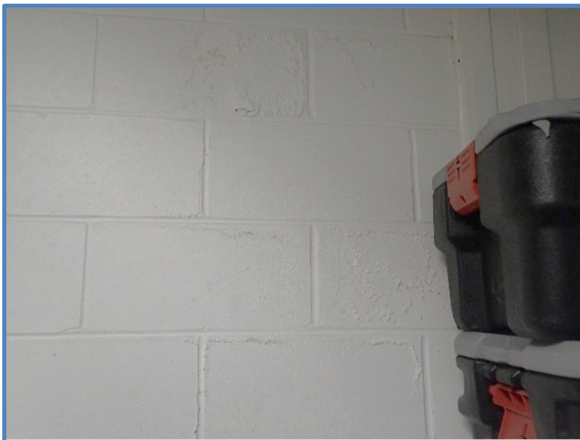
Areas of the painted CMU block wall, located on the second-floor of the main building used as a storage area and maintenance shop. The paint is peeling off the block wall, likely due to the CMU block wall absorbing water.
